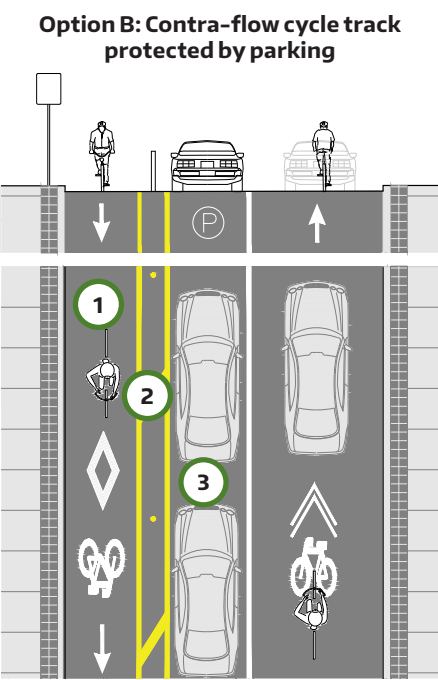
Plan view and street section of buffered contra-flow bicycle lanes.
